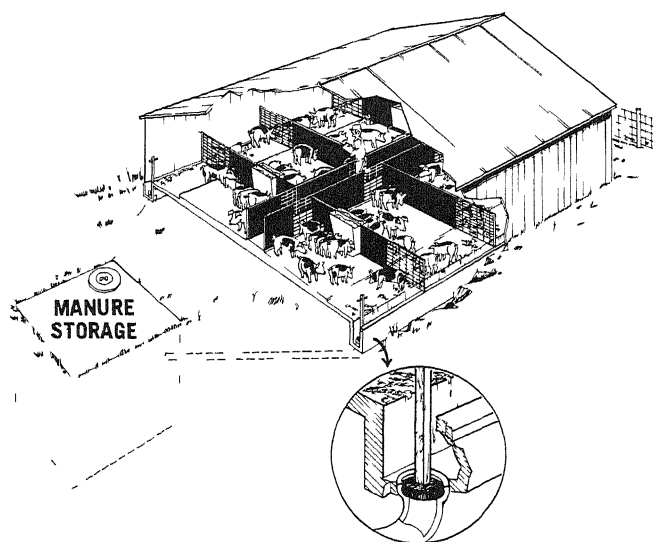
Fed hogs — confined concrete floor, narrow gutter, outside storage, liquid handling.
